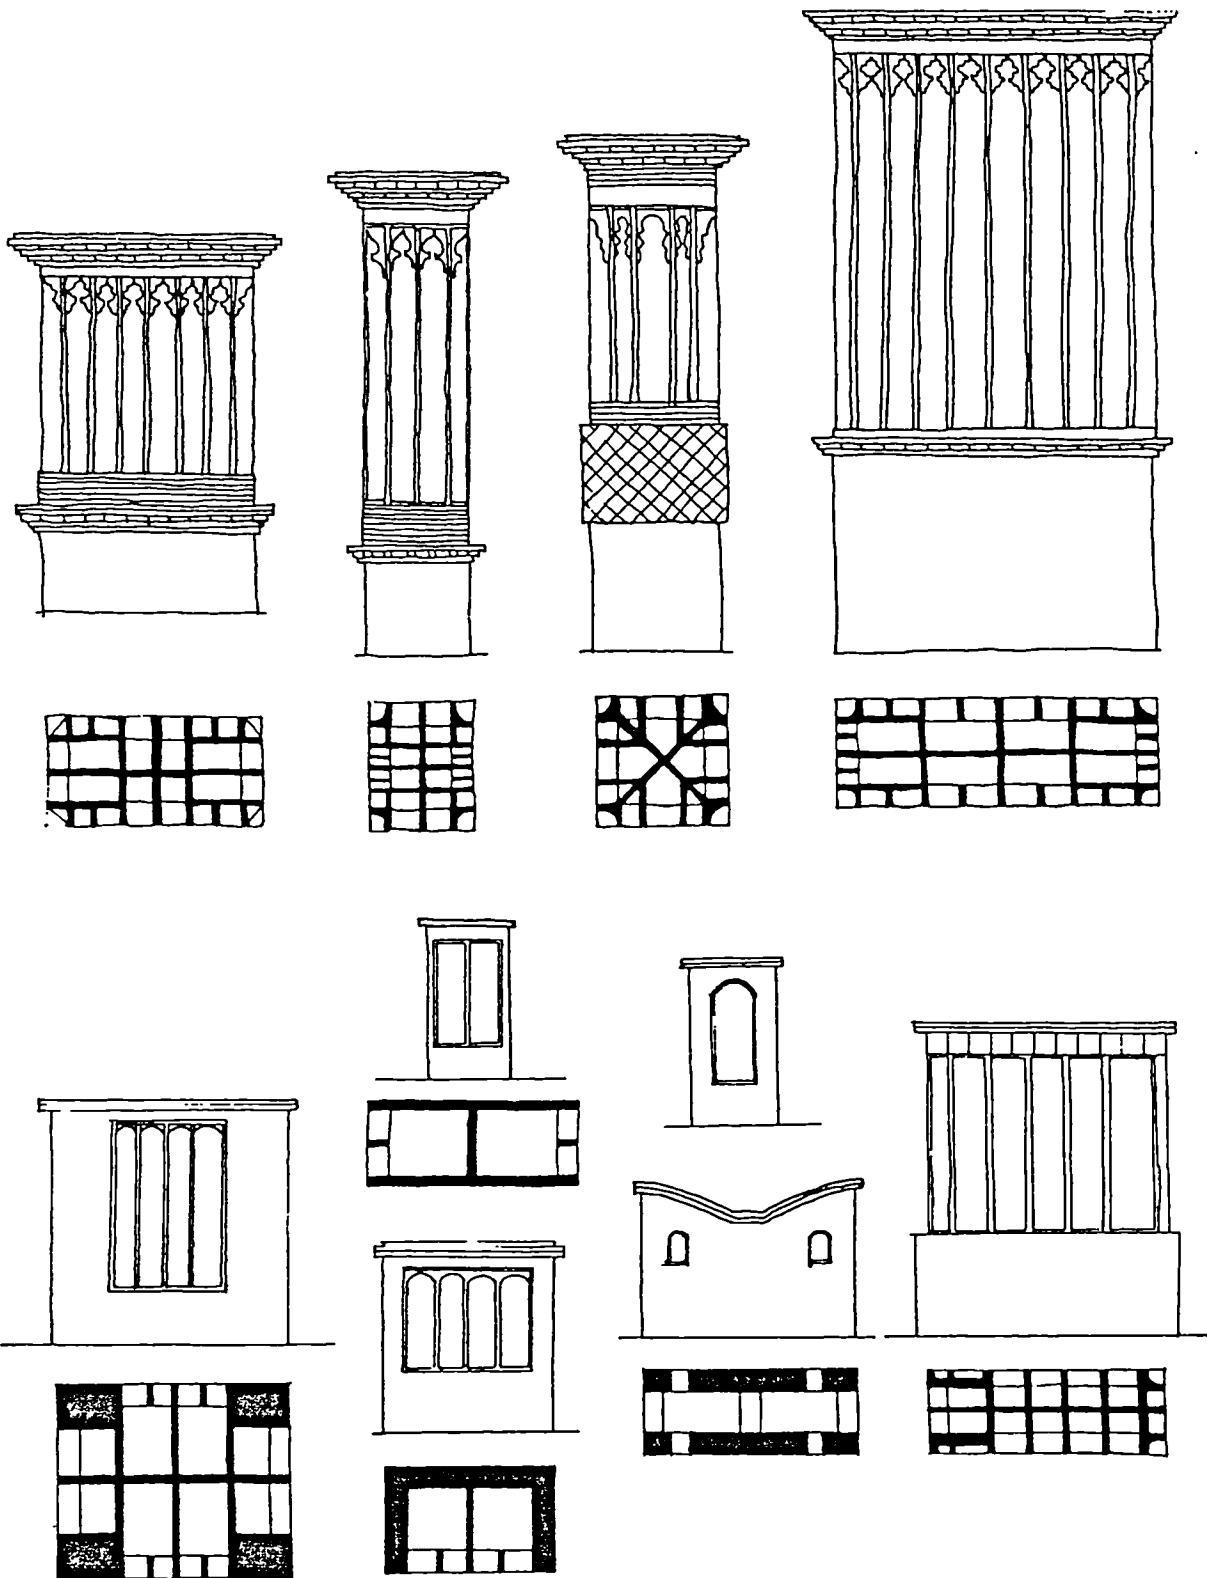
Plans and elevations of simple and more elaborate towers illustrating that complexity of plan does not relate necessarily to the size of the tower or the elegance of its elevation.
